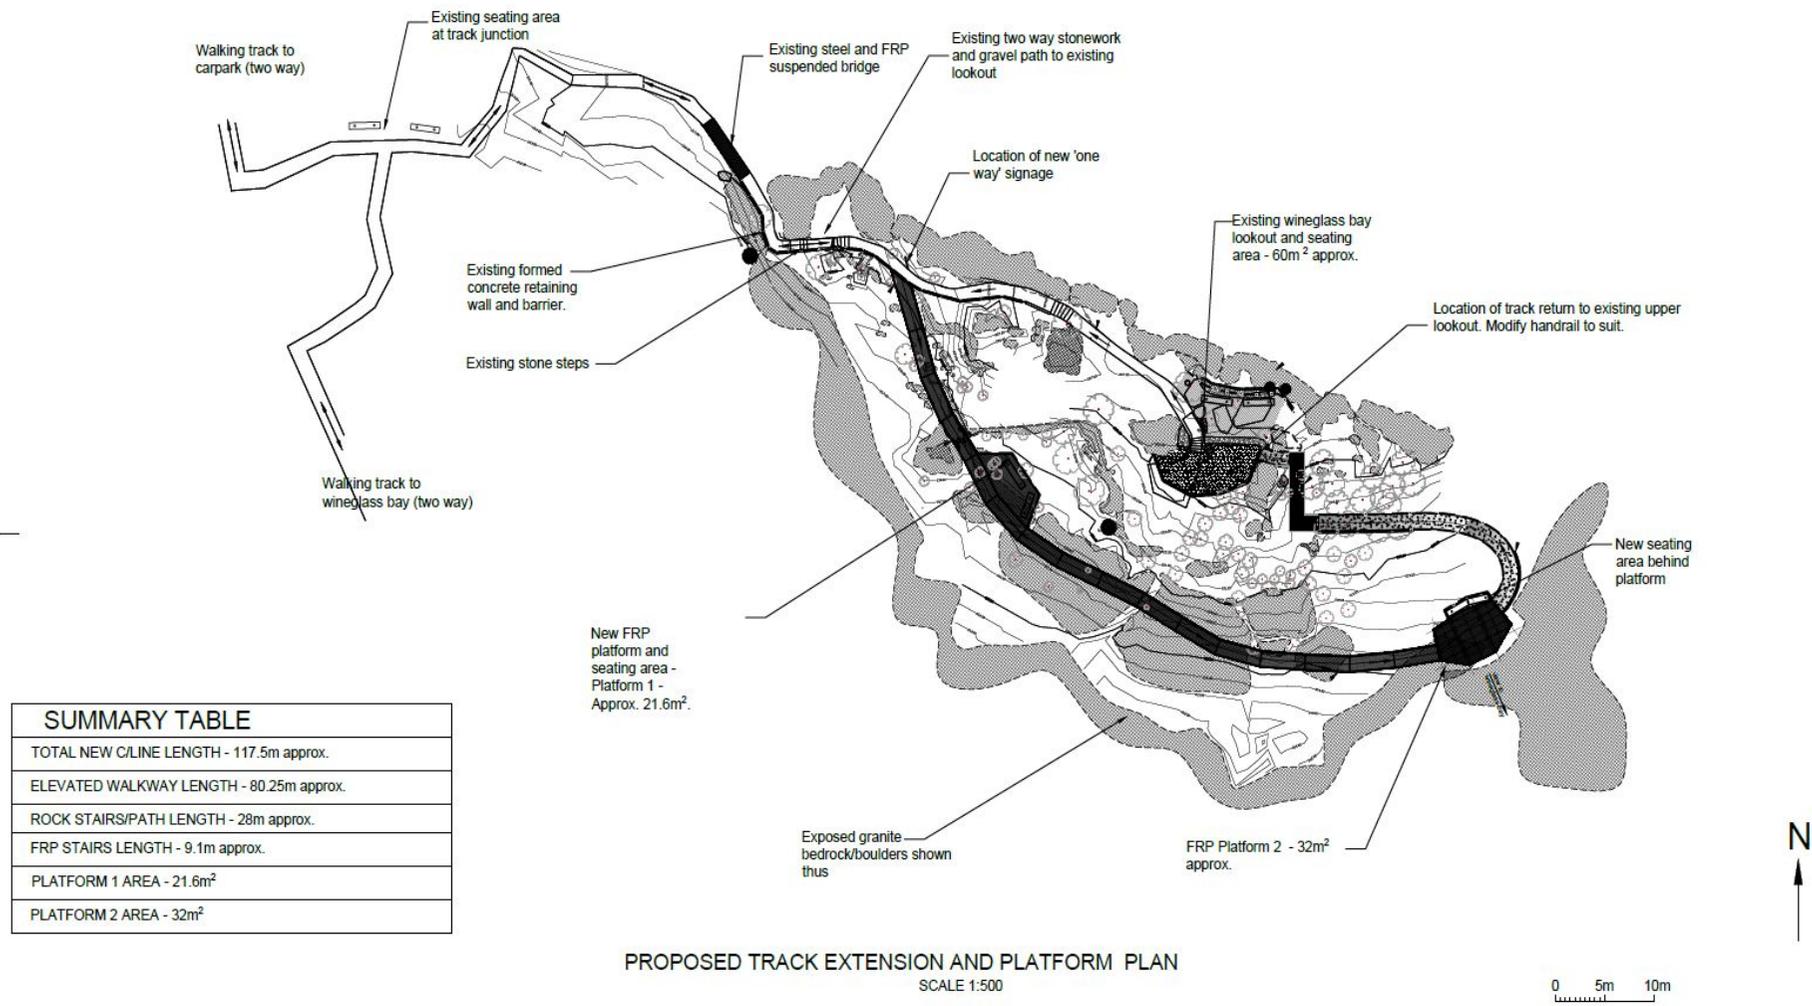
Proposed track extension and platform plan (indicative route only)
